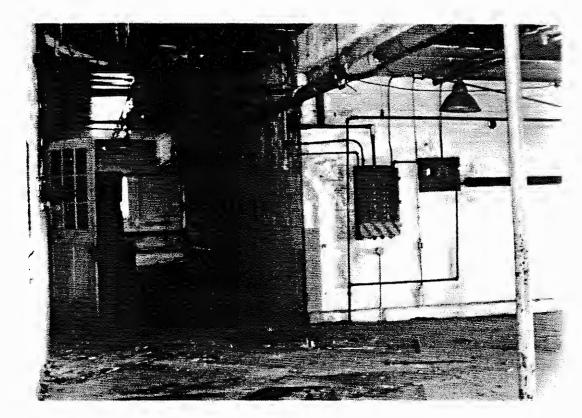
SEAD-16, 9/13/90. Interior of the Abandoned Deactivation Furnace - Building S-311, facing south towards the furnace room (close-up)
